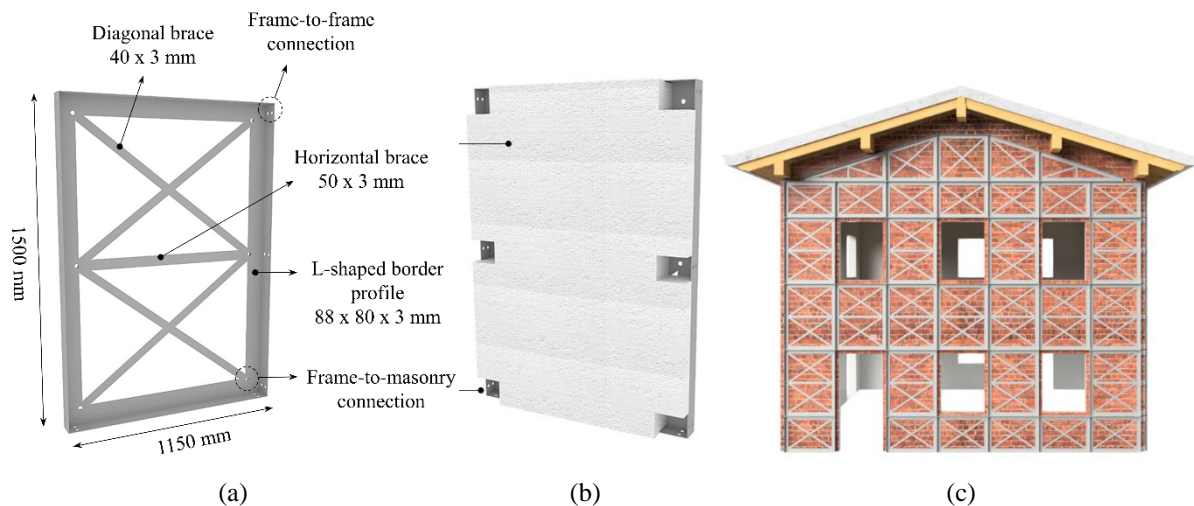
“Resisto 5.9” system: a) retrofit module details; b) insulation panel; c) example of retrofitted facade.
